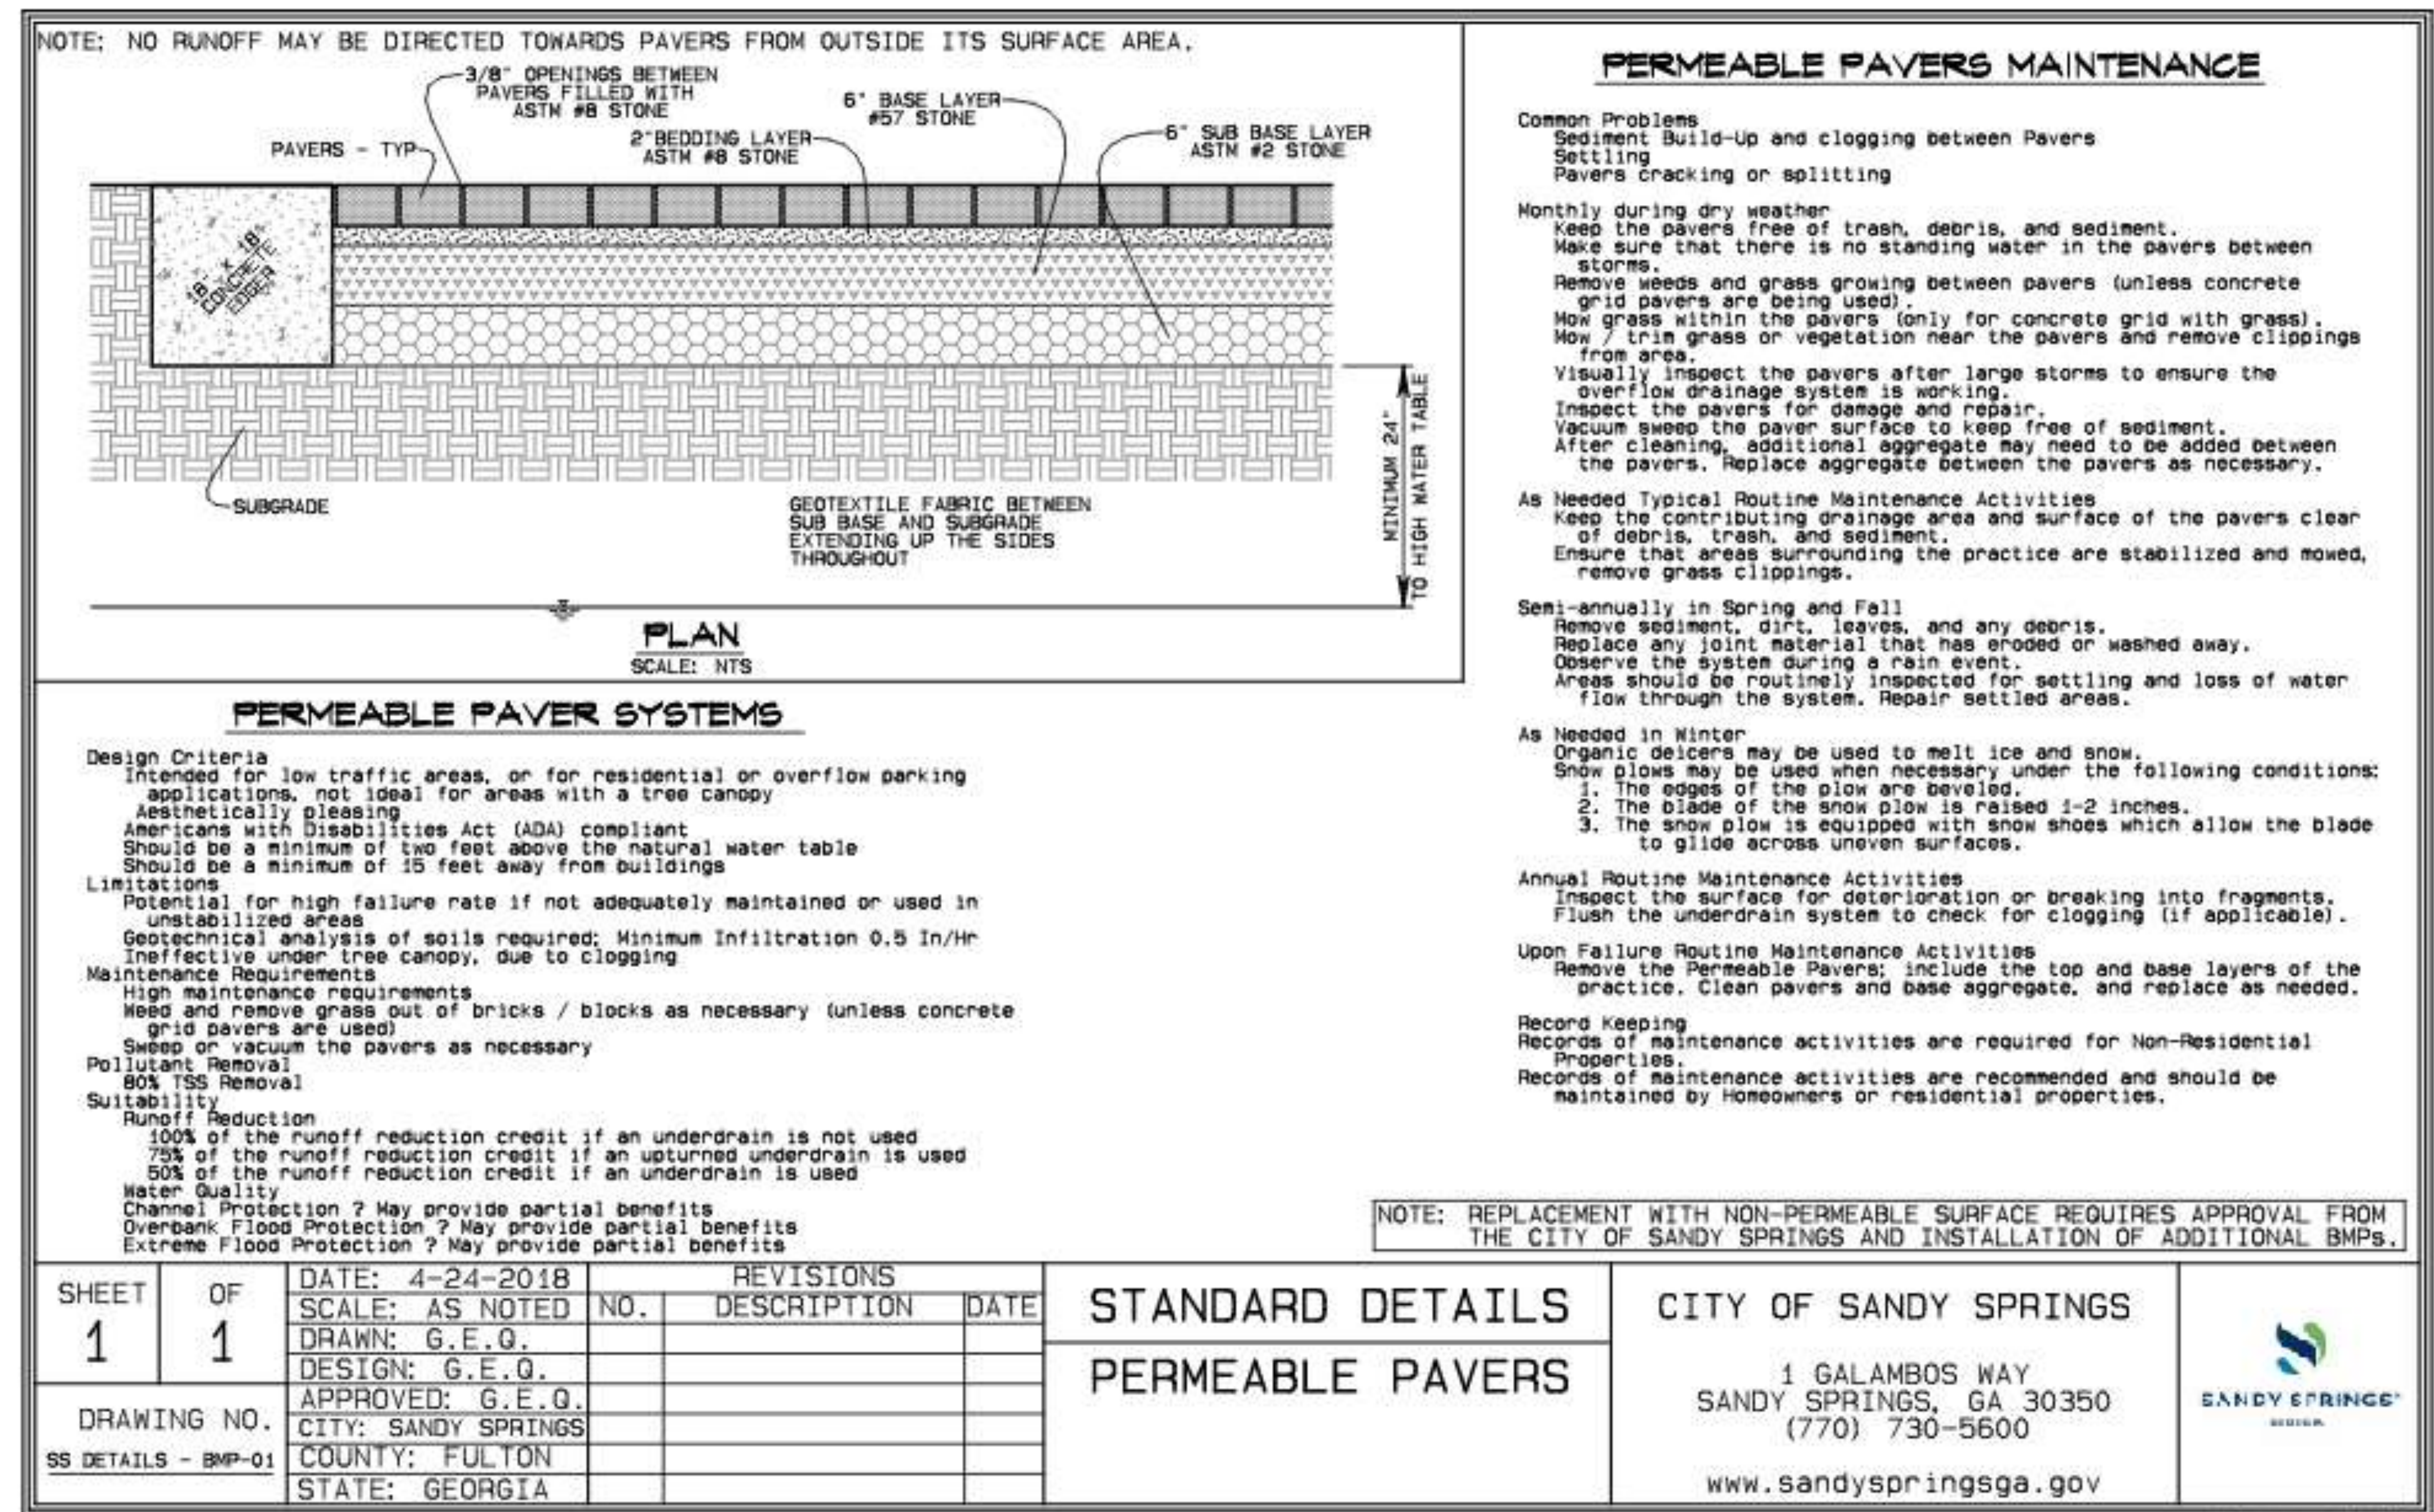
| Permeable Pavers Std Detail (City of Sandy Springs)
